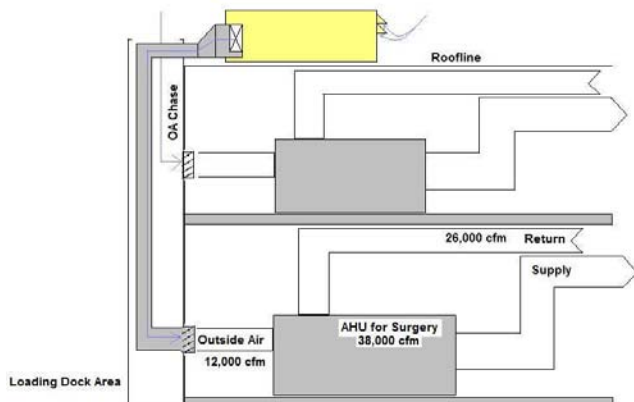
Elevation showing how the desiccant pre-conditioner was installed to treat the ventilation air for the surgical suite.
